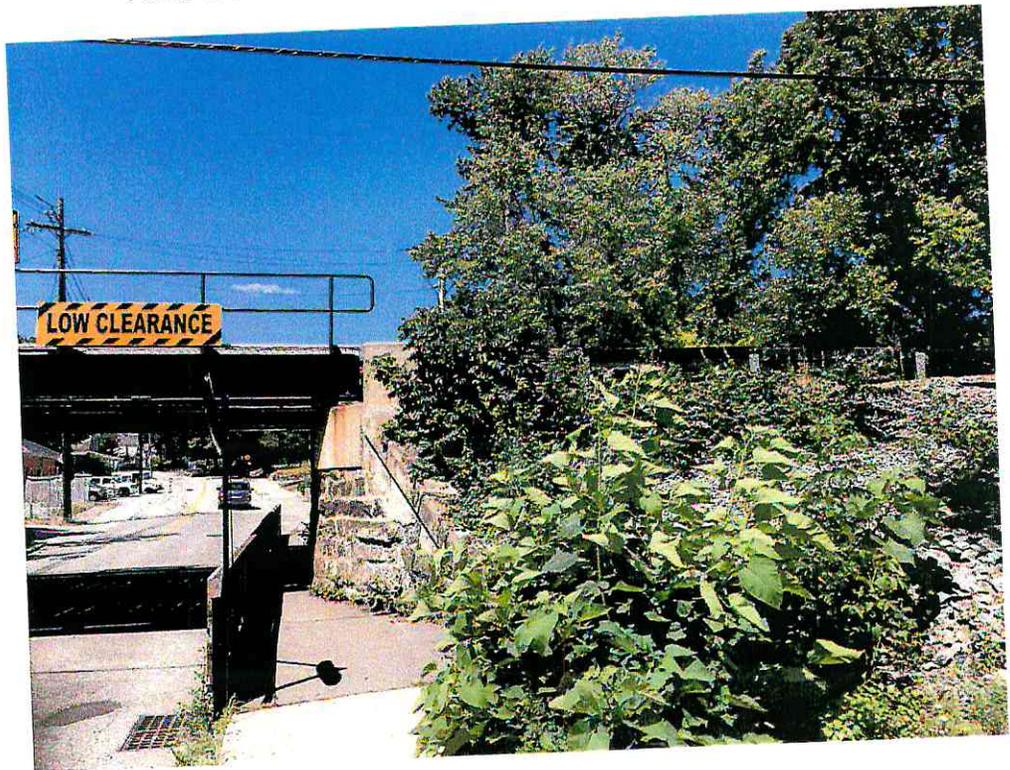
Location p – Cross St. looking west. Middle of Bridge.
